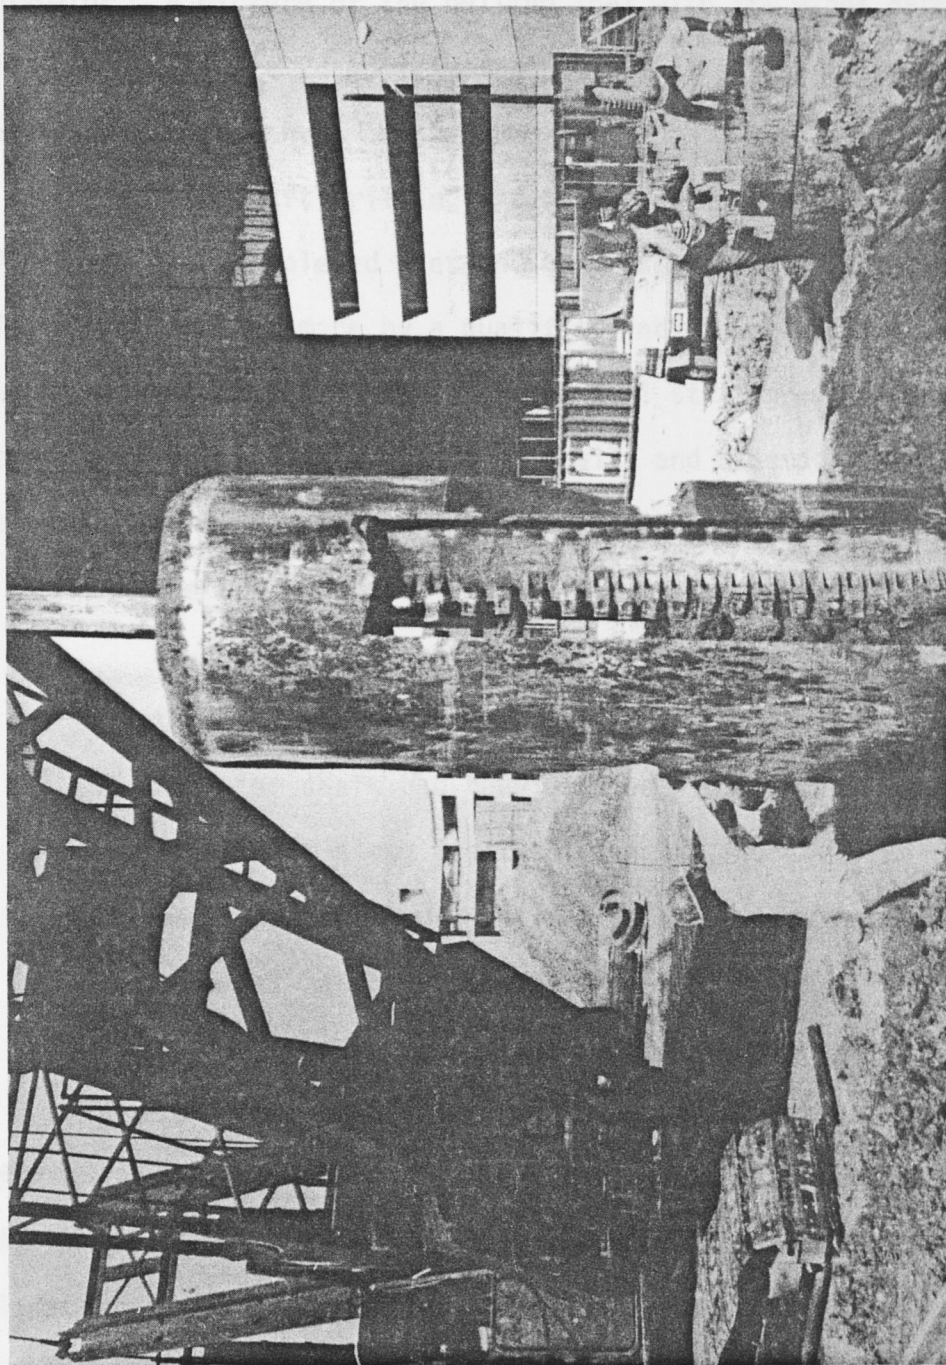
BOTTOM HOLE BELL CUTTING TOOL
